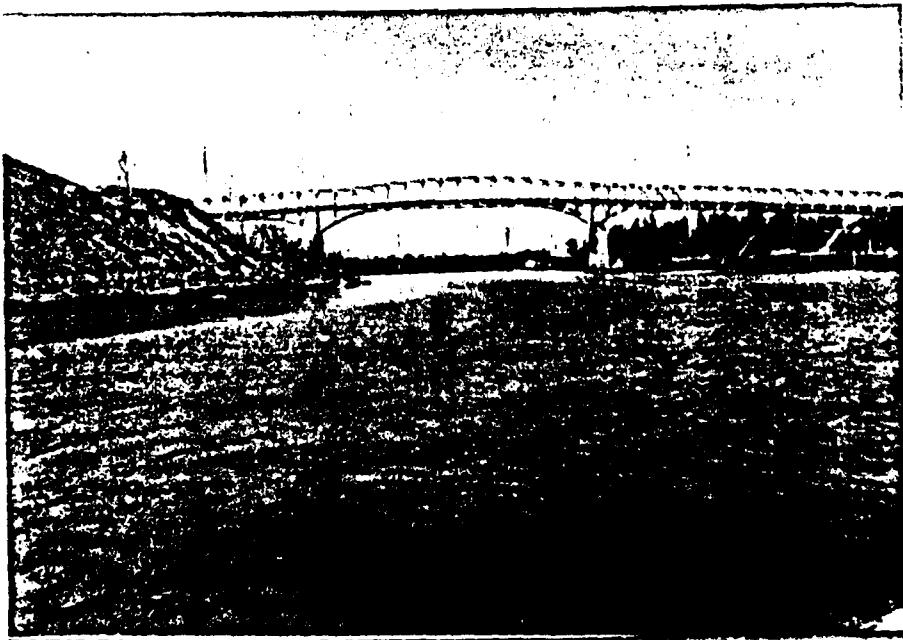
21st Street Bridge looking downstream. Petroleum unloading facility on the east bank.
